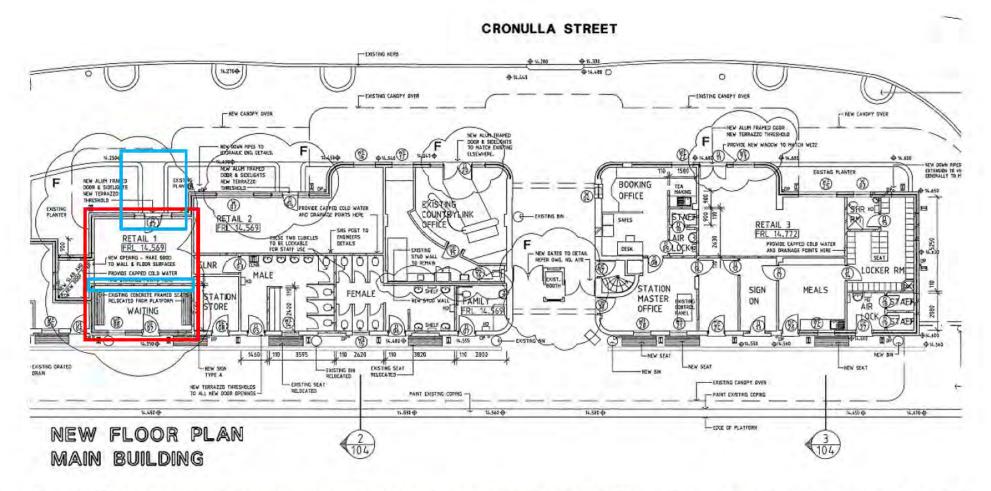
1994 plan showing the proposed reconfiguration of the subject site, outlined in red. The 1994 modifications are outlined in blue and show the modified fabric (Source: Sydney Trains Plan Room, EDMS CV0073254).
